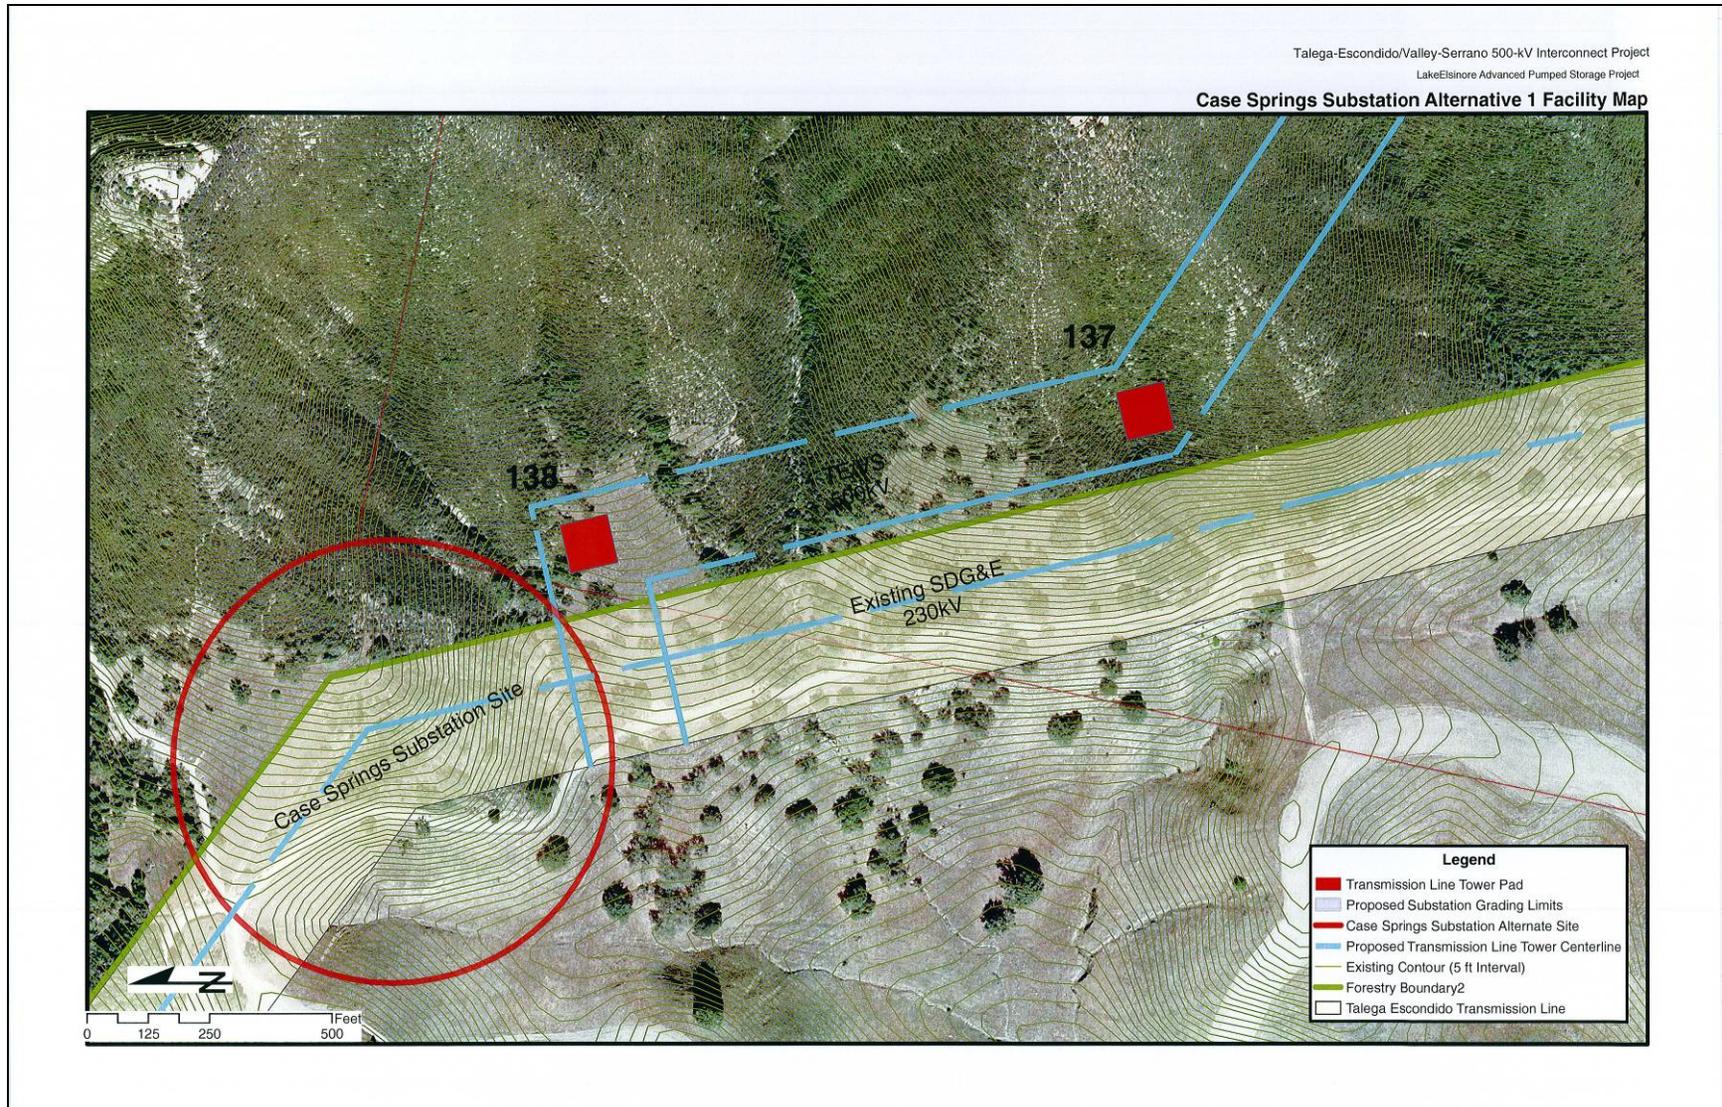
Alternative Case Springs Substation Site
